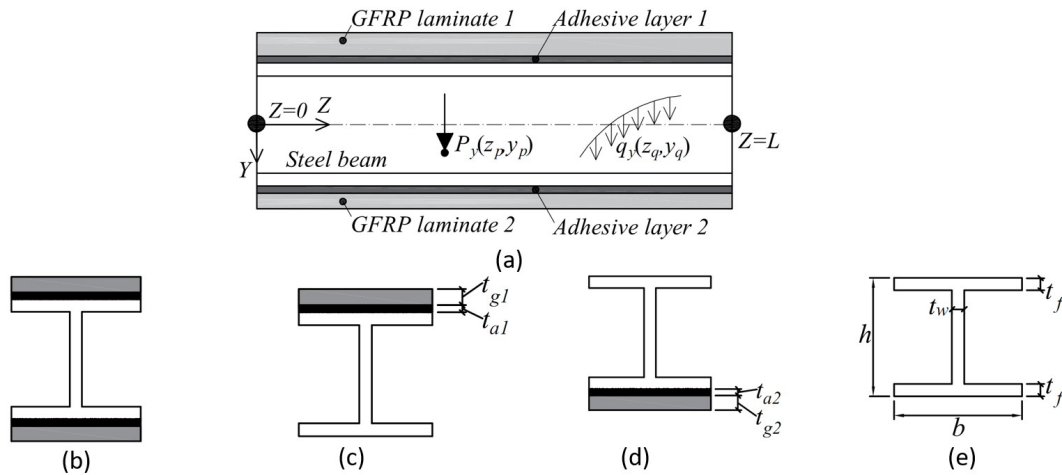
Statement of the problem: (a) A general element of a steel beam bonded with two GFRP laminates; and the cross-sections of four steel beam elements (b) bonded with top and bottom GFRP laminates, (c) bonded with a top GFRP laminate, (d) bonded with a bottom GFRP laminate, and (e) not strengthened.
